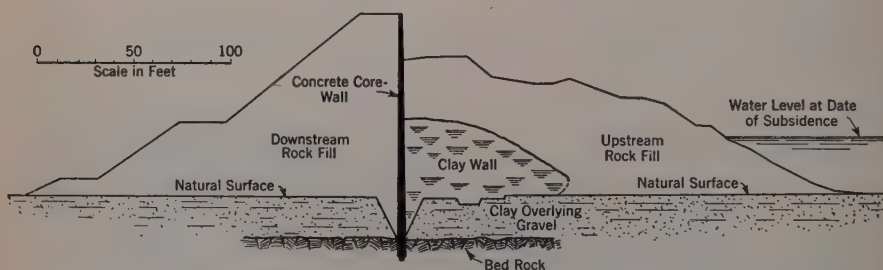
TYPICAL CROSS-SECTION OF EMBANKMENT, EILDON RESERVOIR, AFTER SUBSIDENCE, APRIL, 1929
